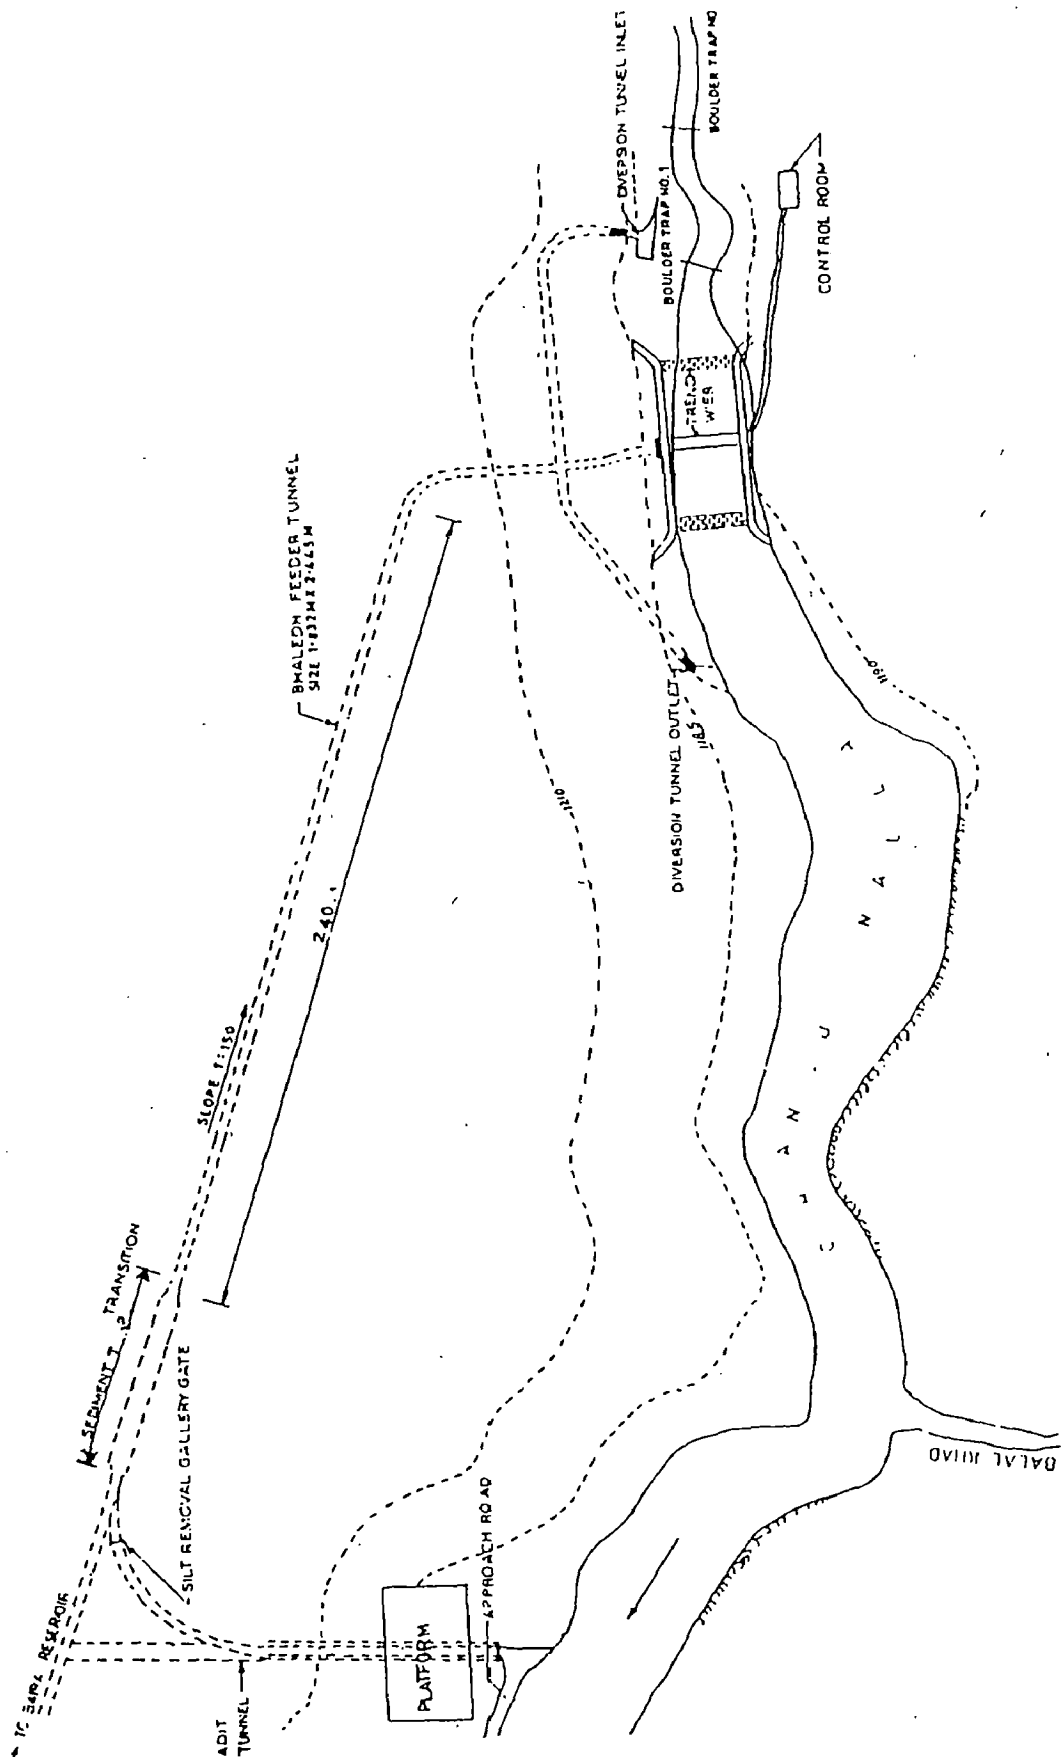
BHALDEH COMPLEX LAYOUT SHOWING DESILTING ARRANGEMENT
